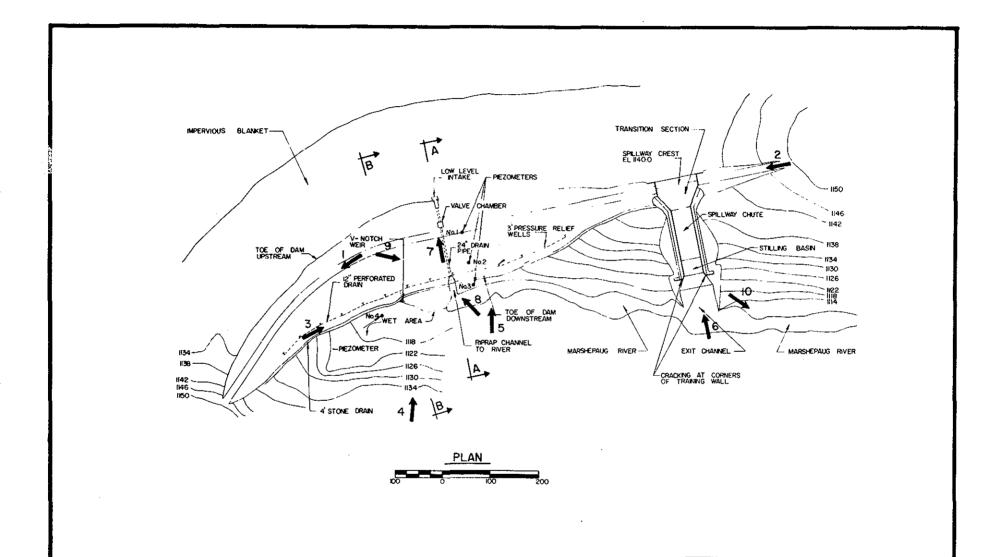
PHOTO LOCATION PLAN WOODRIDGE LAKE DAM
